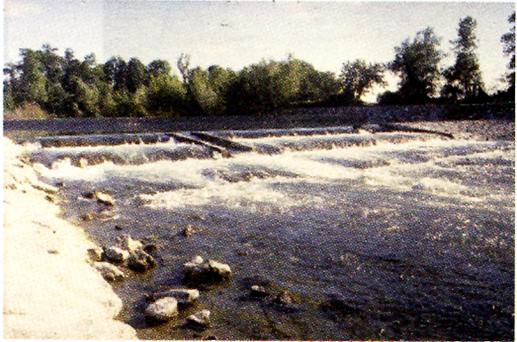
Stepped lined rock structure on the Adour river (Pyrénées).
